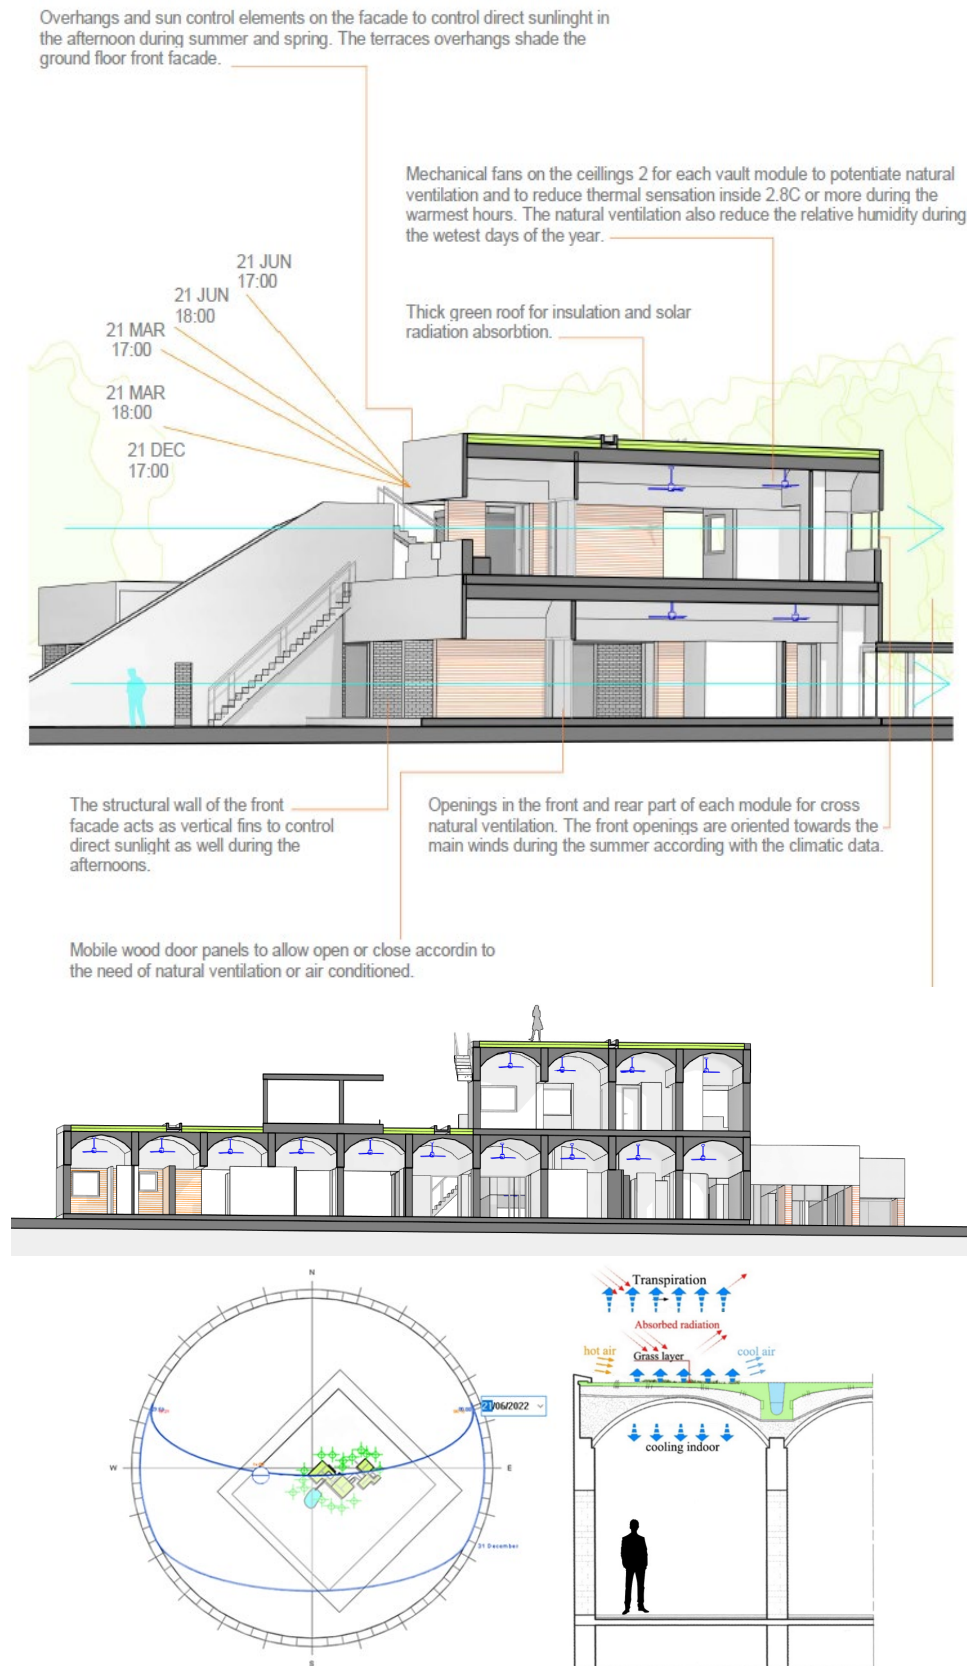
Design strategies applied in the Sarabhai House, longitudinal-section, location site plan with sun path and detail of the green roof. Source: Drawing by the author.
